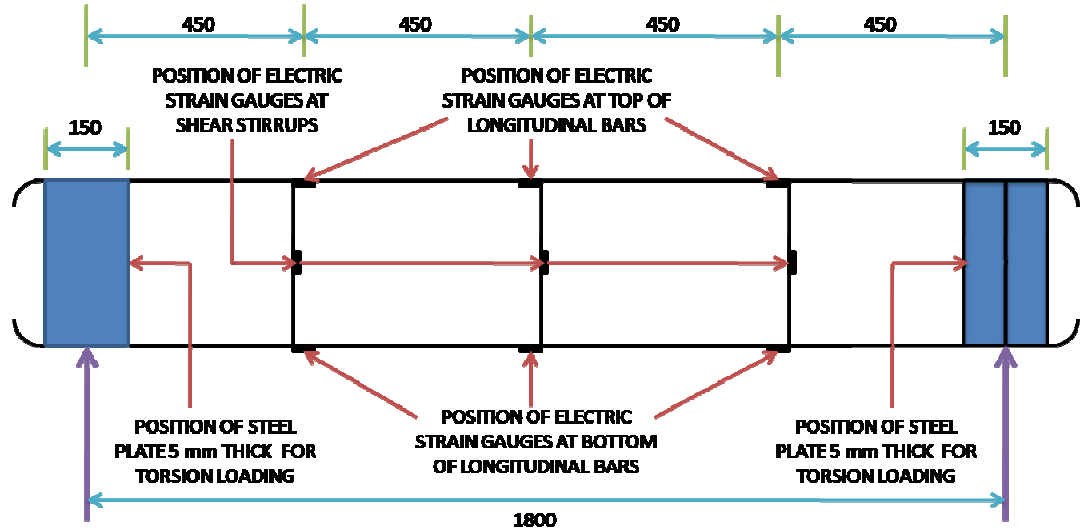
Schematic Diagram Beam PTT – 1 showing Reinforcement, Electric Strain Gauges and Steel Plates at Both Ends for Torsion Loading
